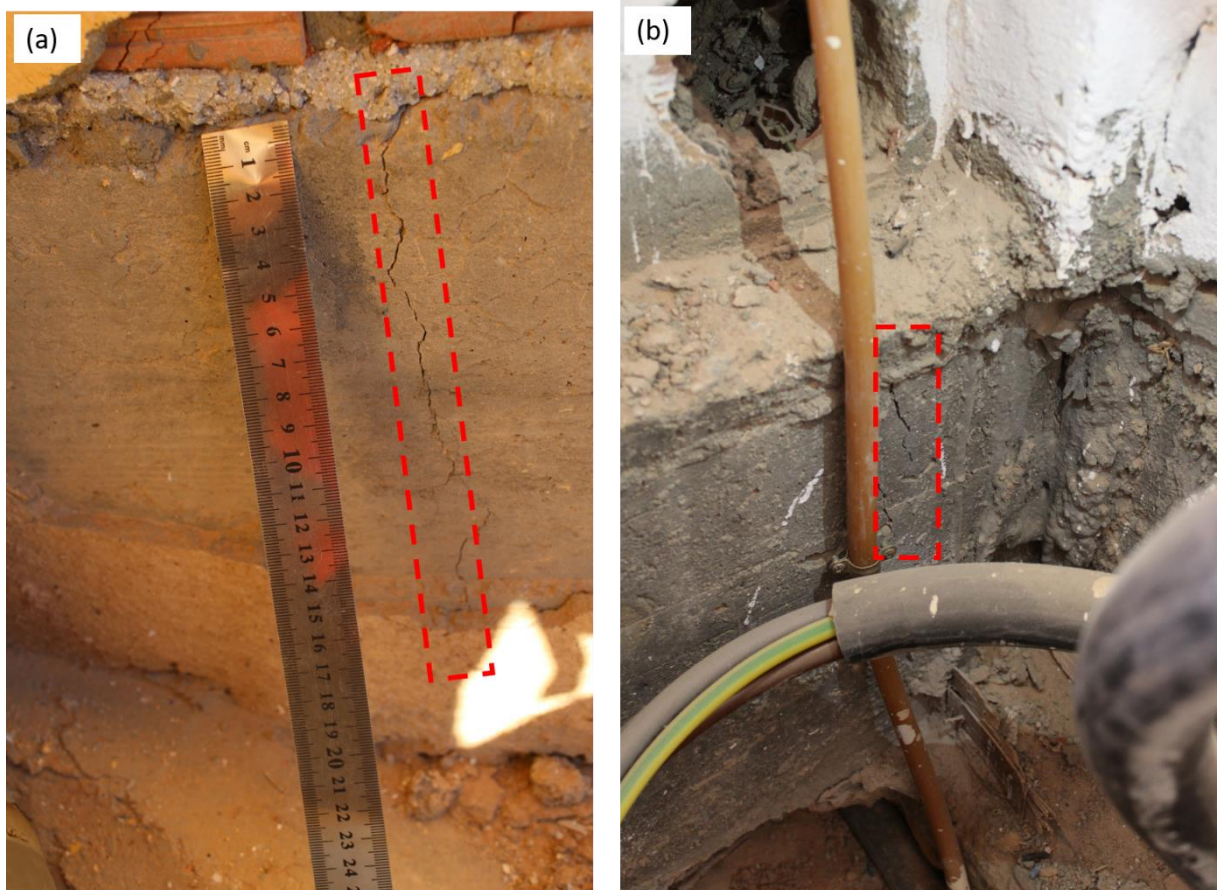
Plinth beam cracking recorded on: (a) Exterior of the building 4 of Area 3; (b) Interior of the building 13 of Area 4.
